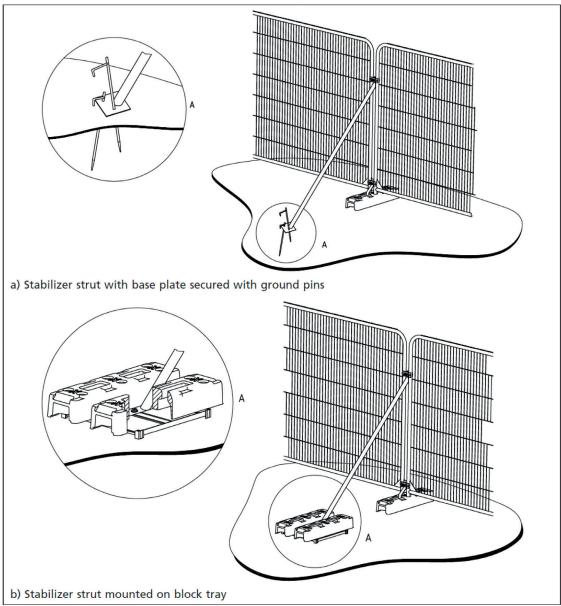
Tree Protection Detail (Herras type fencing or similar approved.
